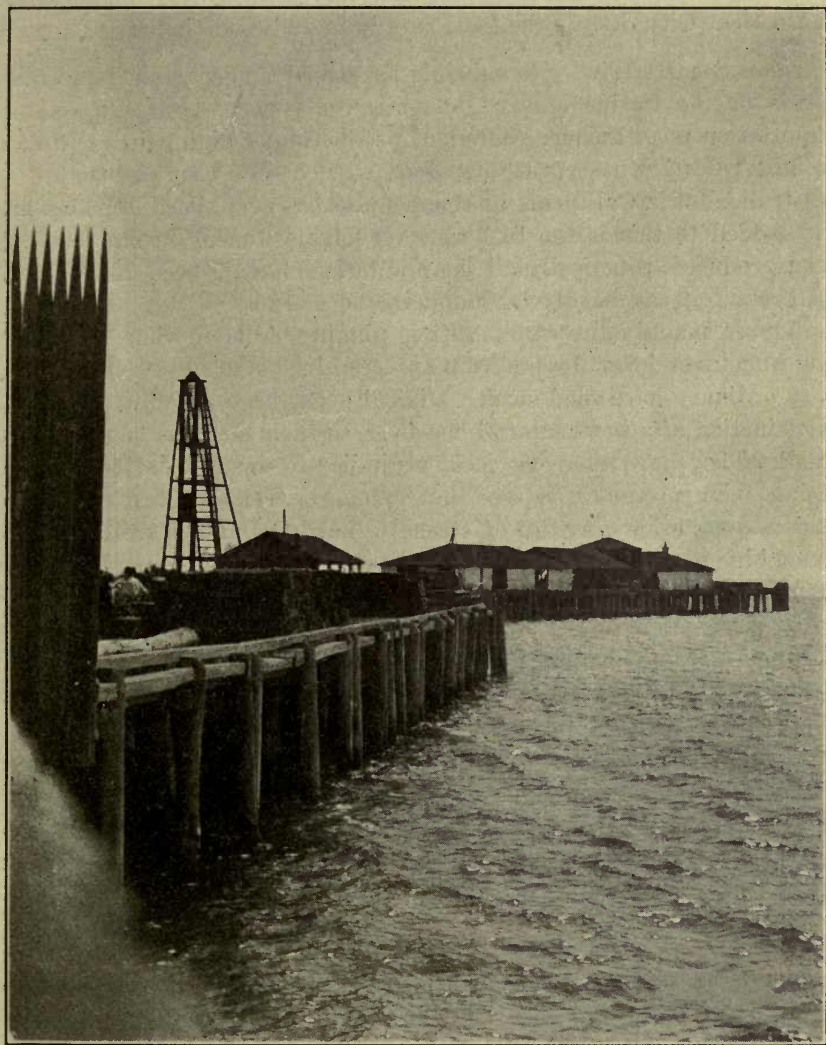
Blue gum piling in the wharf at Santa Barbara.
